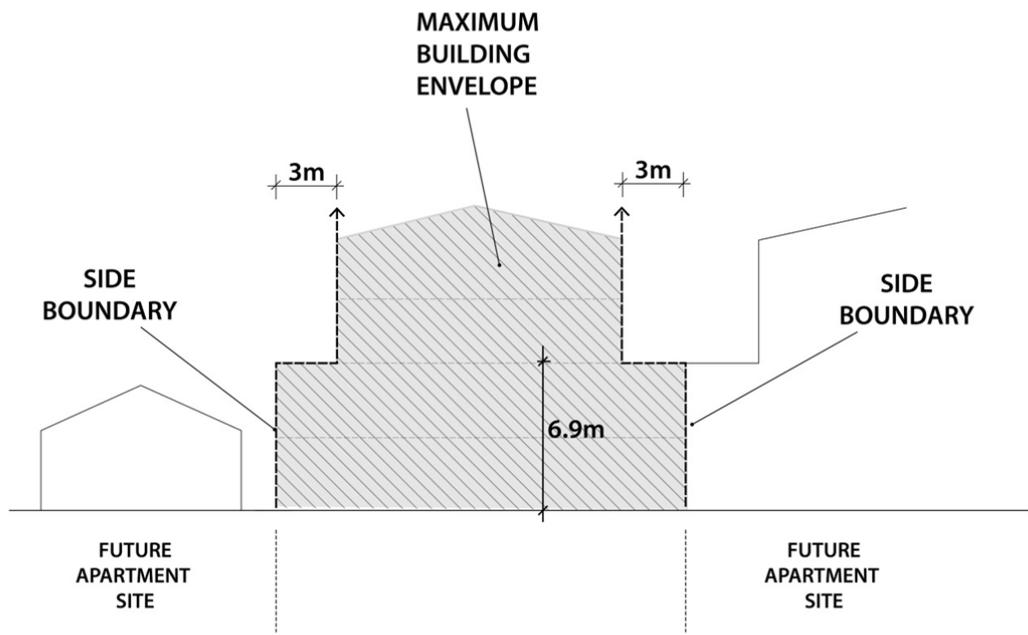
Garden Apartments Walls on Boundaries and Side Setbacks (elevation)
